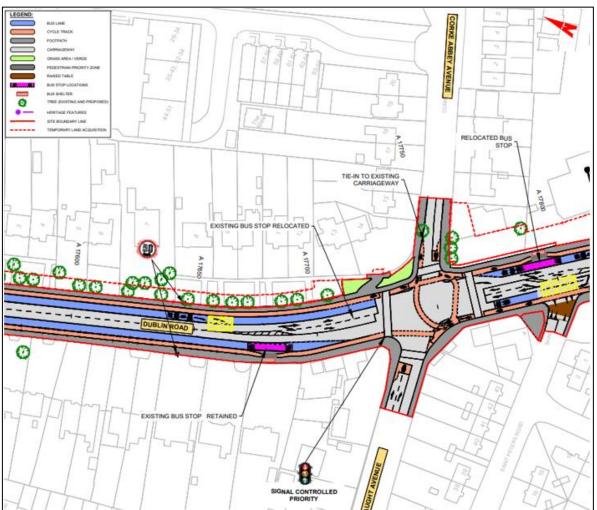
Extract from General Arrangement Drawings at Dublin Road, Bray (Sheet 50)
